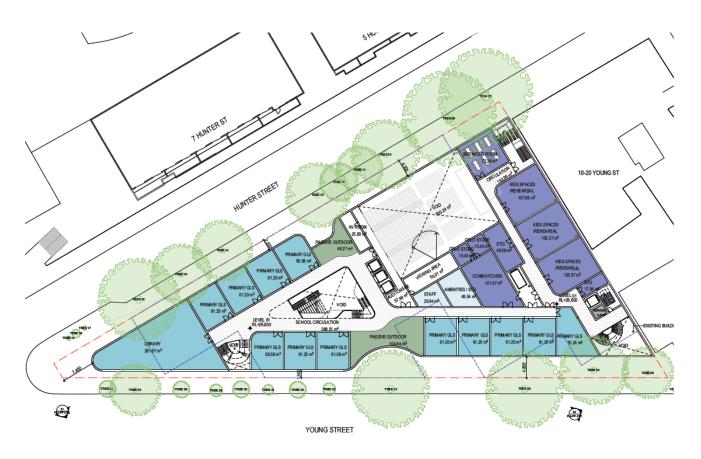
Indicative typical floor plan. Source: Plus Architecture Urban Design Report
